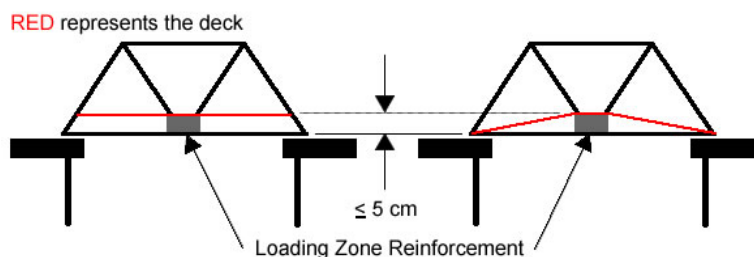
Sideview of two acceptable deck configurations. The deck must pass over the loading zone. To allow for loading zone reinforcement, the deck may be elevated a maximum of 5 cm from the table surface.
